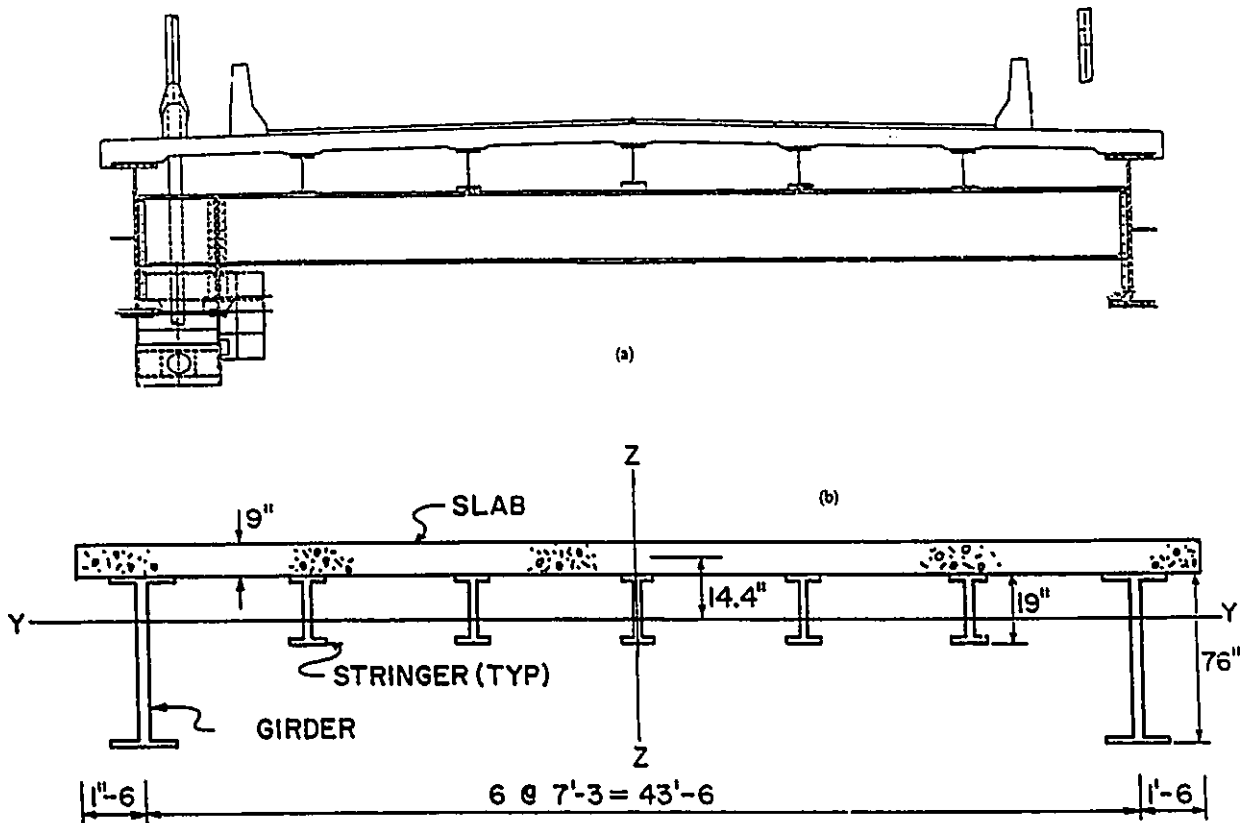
Idealized Deck Cross Section of Quincy Bayview Bridge (Wilson and Gravelle, 1991)
